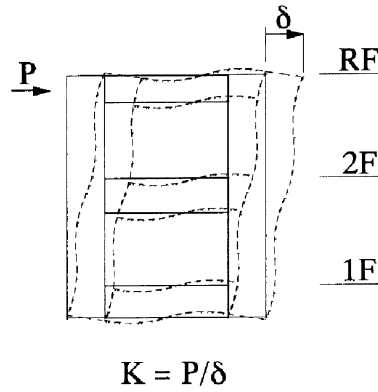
Horizontal stiffness K at roof floor level of RC rigid frame
